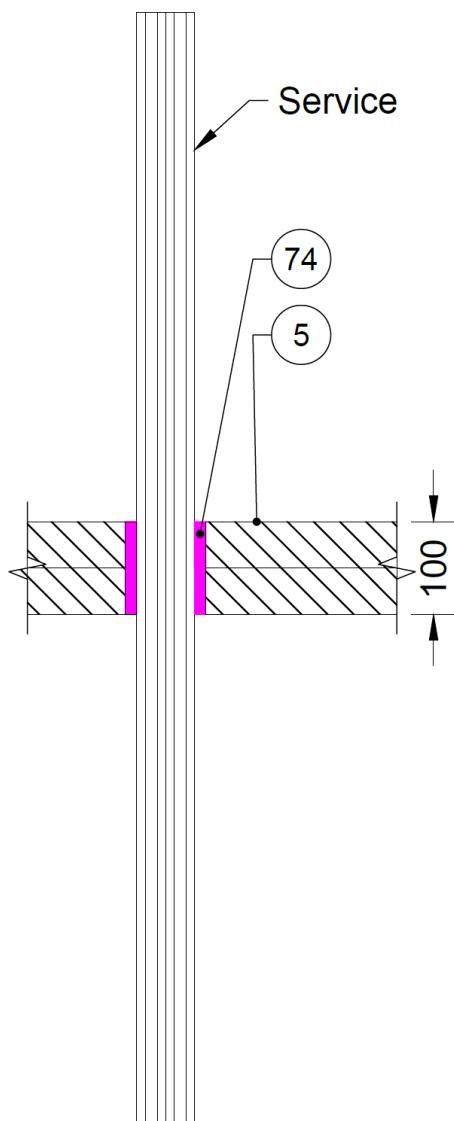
Section View of Pair coil, drain hose and cables Installed in Horizontal Substrates
